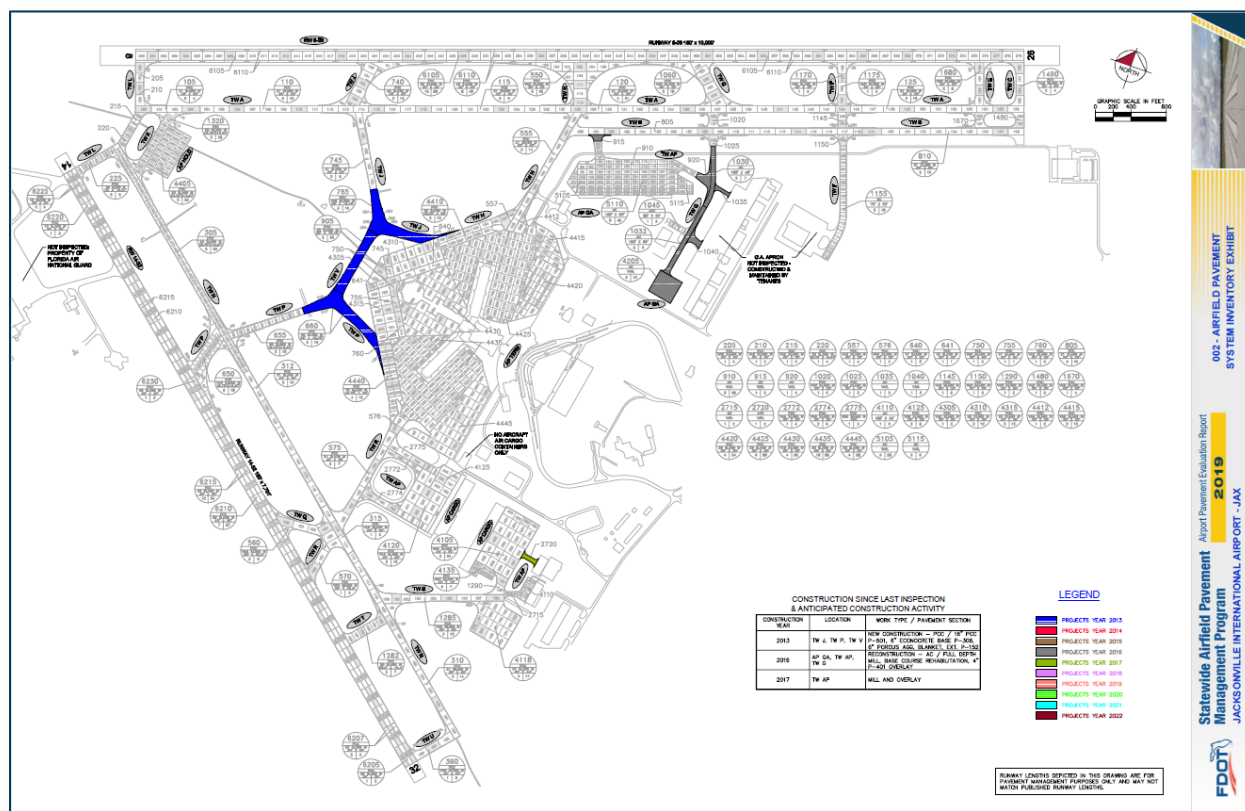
(a) 2019 Airfield Pavement Network Definition Exhibit
